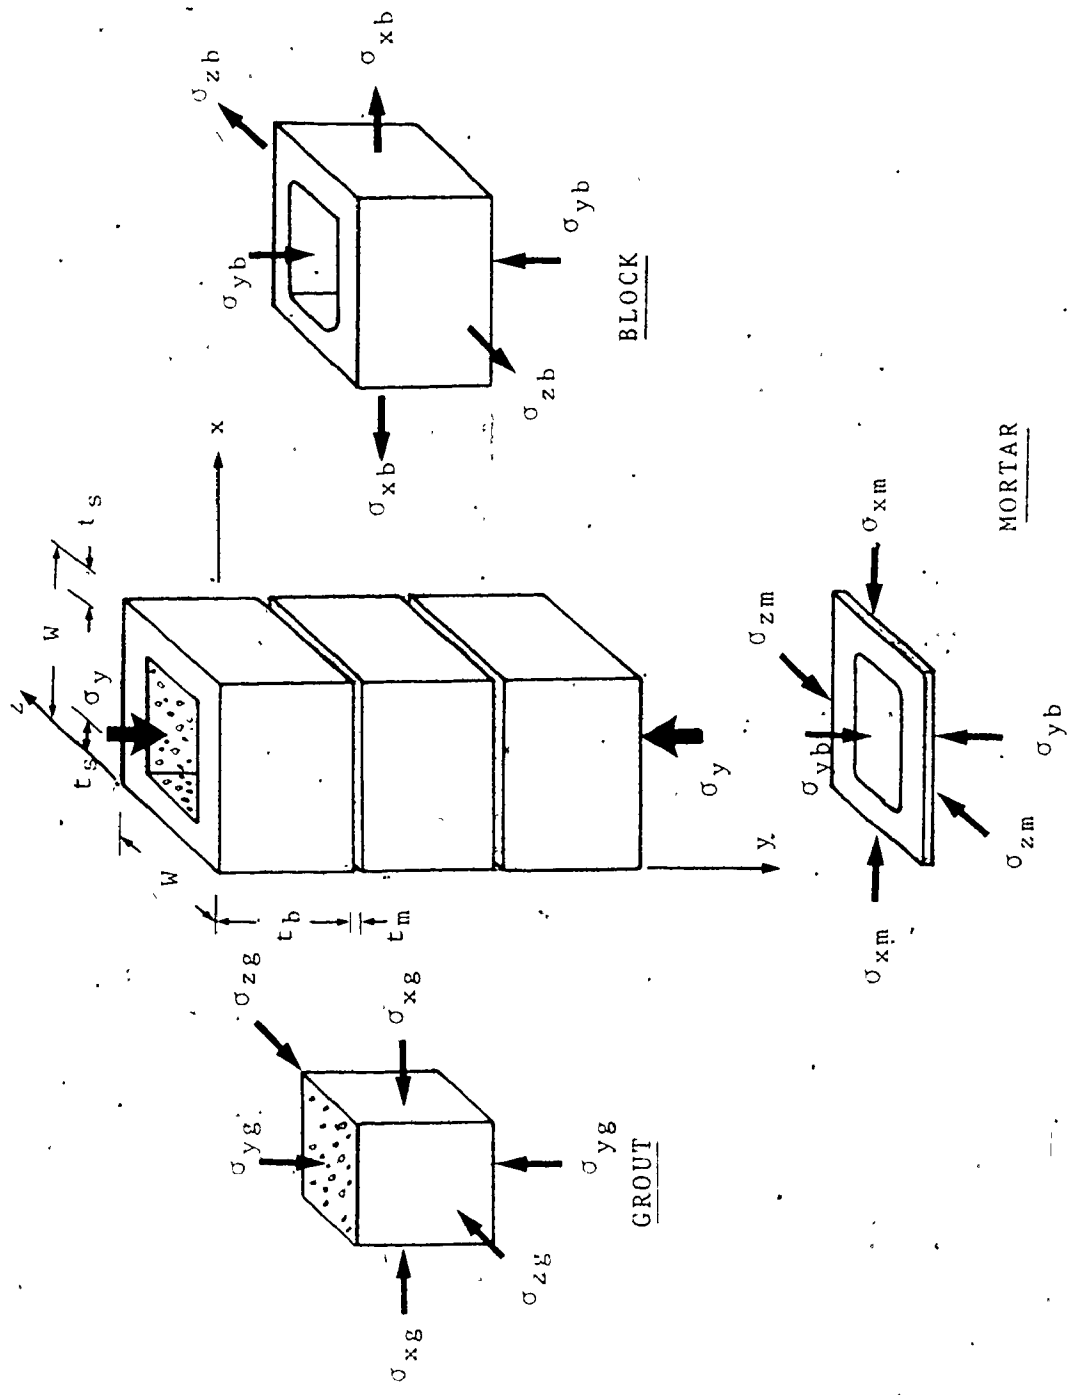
ILLUSTRATION OF THE STRESSES DEVELOPED IN THE COMPONENTS OF A GROUTED MASONRY PRISM LOADED UNDER AXIAL COMPRESSION
